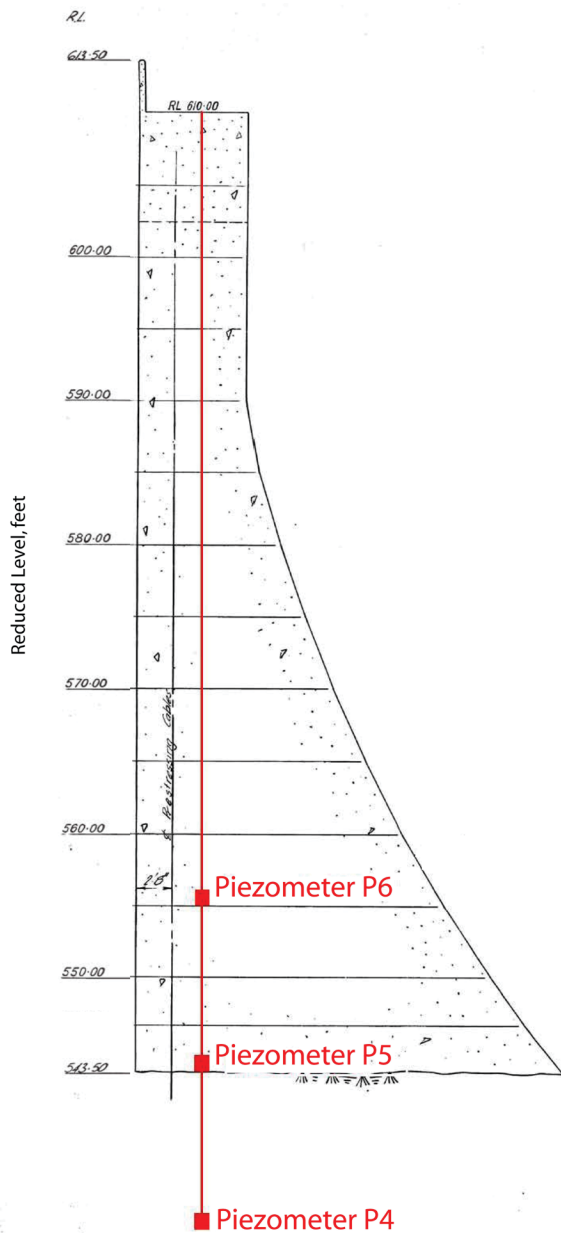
Cross section of dam showing concrete lift joints and typical piezometer configuration.
